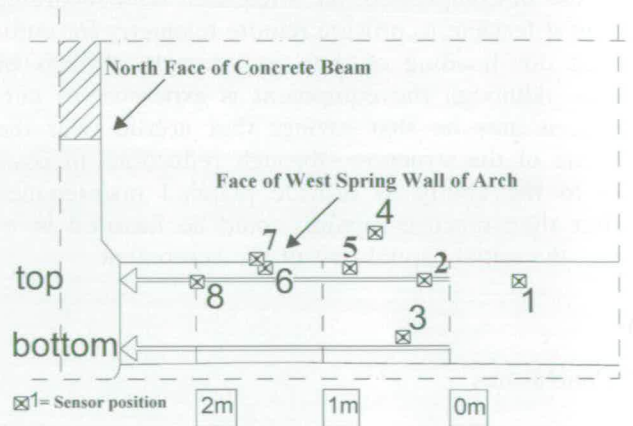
Elevation of radar survey lines along west spring wall of arch.
